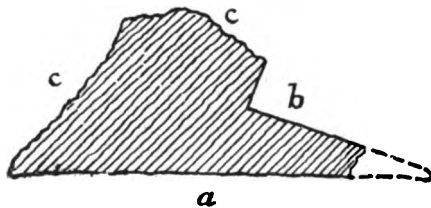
SECTION OF CONCRETE FILLING, "BUTTRESSED BUILDINGS. (1).
